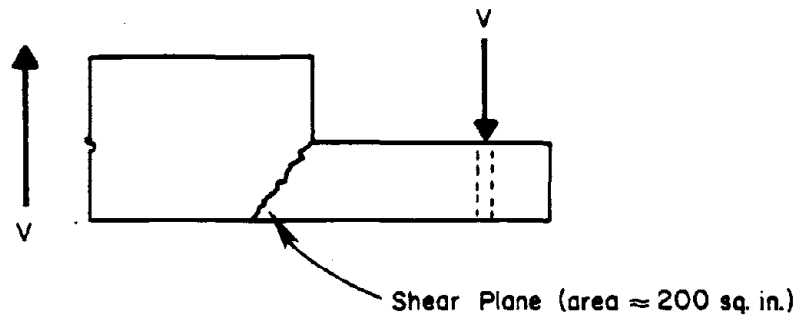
Shear Plane in Concrete When Connection is in Shear.
